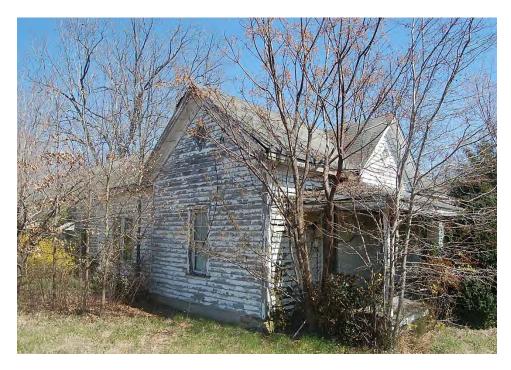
Thomas Woolard Farm, House, Side (West) Elevation and Facade, Looking Northeast.
